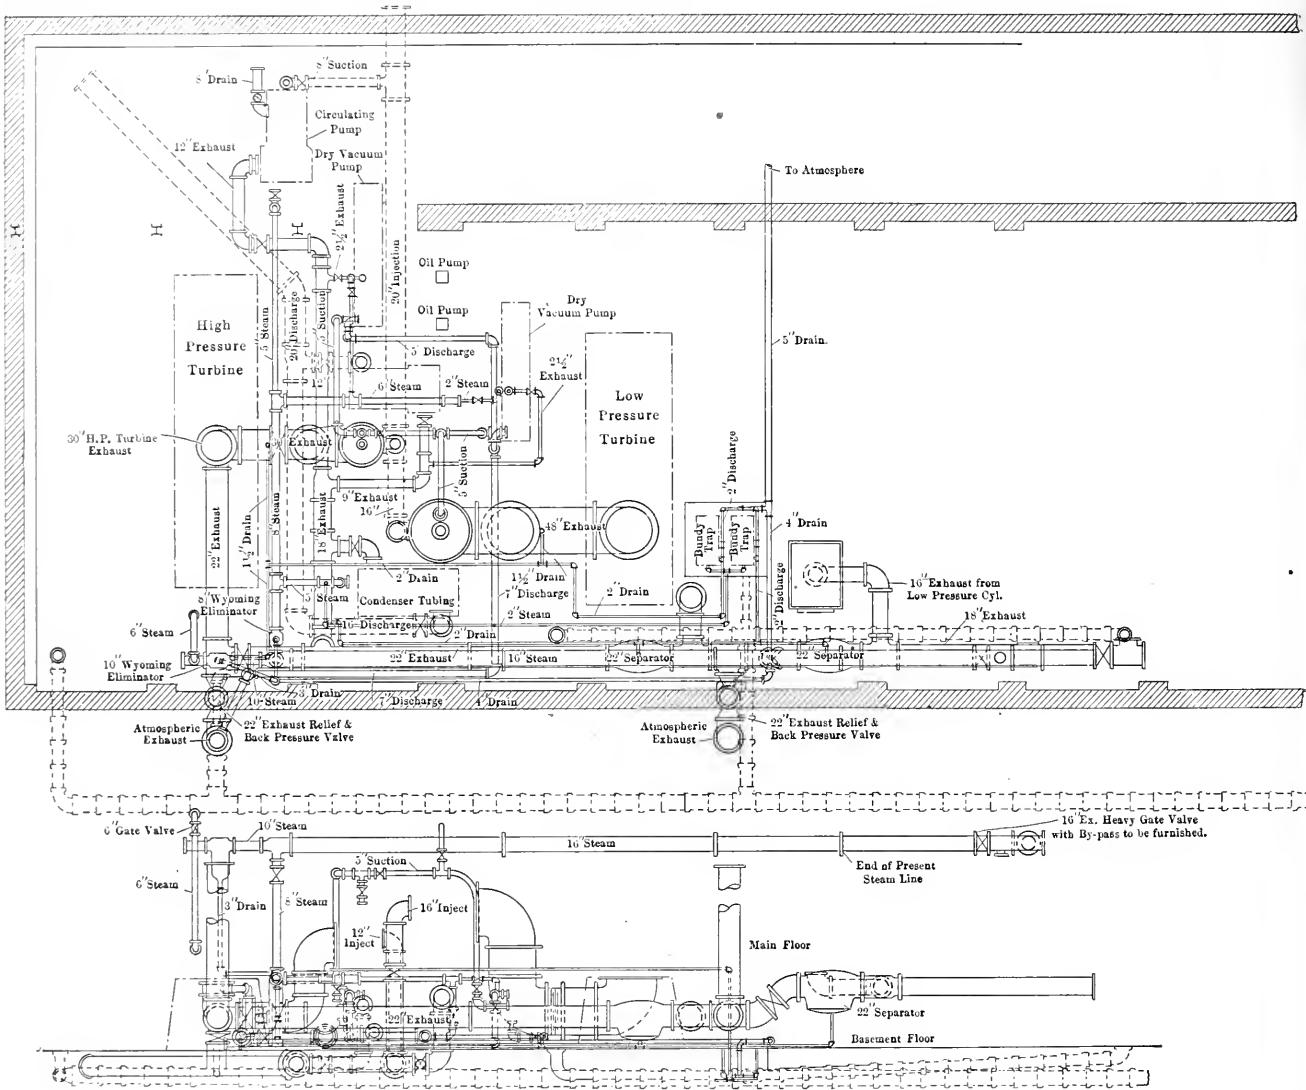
PIPING PLAN AND ELEVATION OF TURBINE EXTENSION TO POWER PLANT
